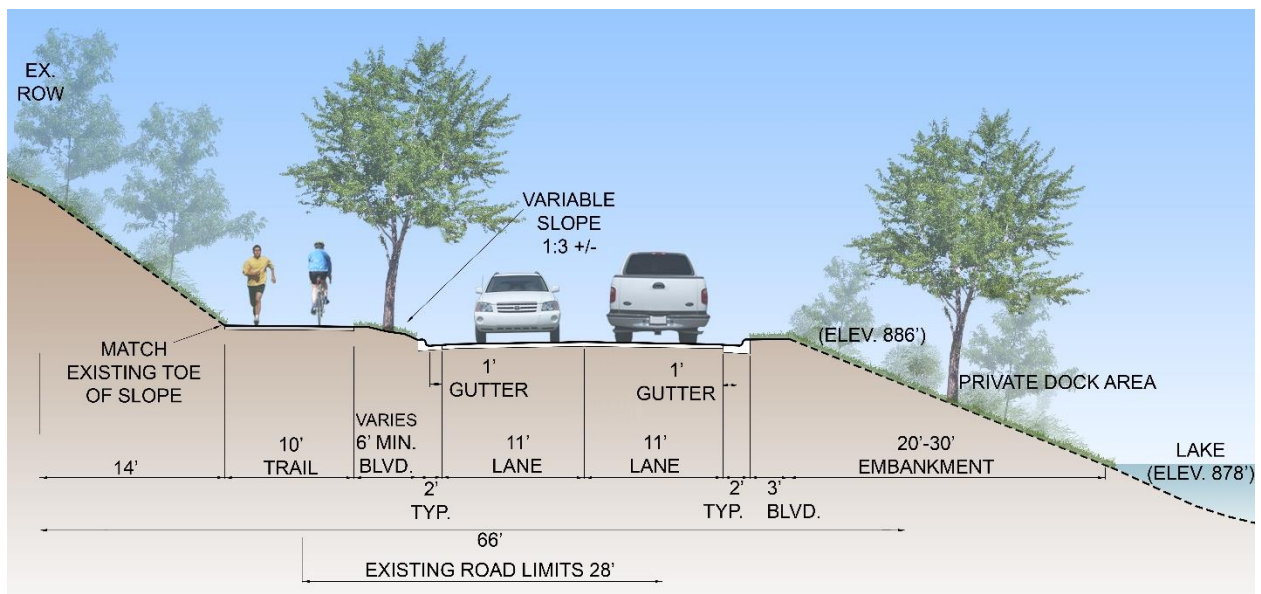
Typical Section B – Stowe Avenue to County Road E West Side Concept
